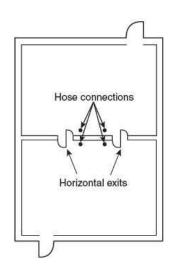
(b) Location of Hose Connections at Horizontal Exits.
